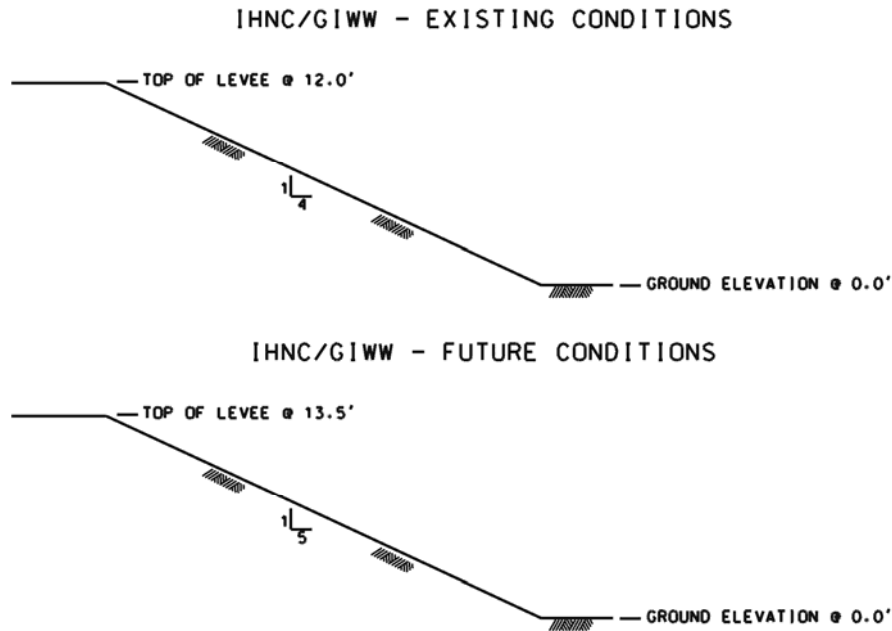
Typical Levee Design Cross-Section – IHNC (IH03) and GIWW (GI01 and GI02 sections only!) levees for existing (upper panel) and future conditions (lower panel).
